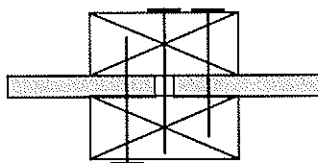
A detail of an intermediate stud in a midply wall where the two panels meet
